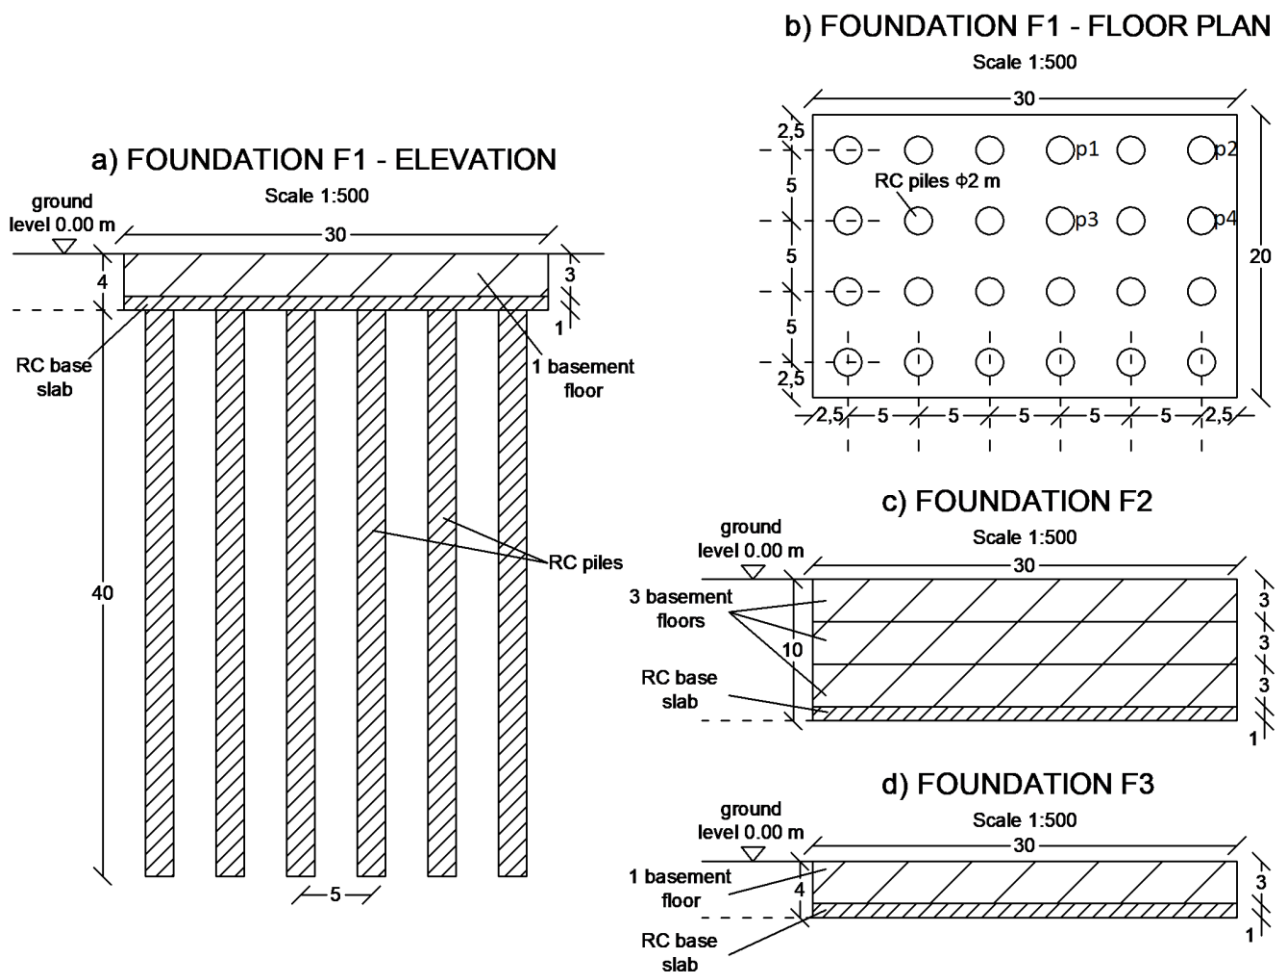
Layout of the foundation systems: (a) elevation and (b) floor plan of the piled-raft foundation – F1; (c) compensated foundation with three basement floors ($D=10\text{ m}$) – F2; (d) compensated foundation with one basement floors ($D=4\text{ m}$) – F3.
